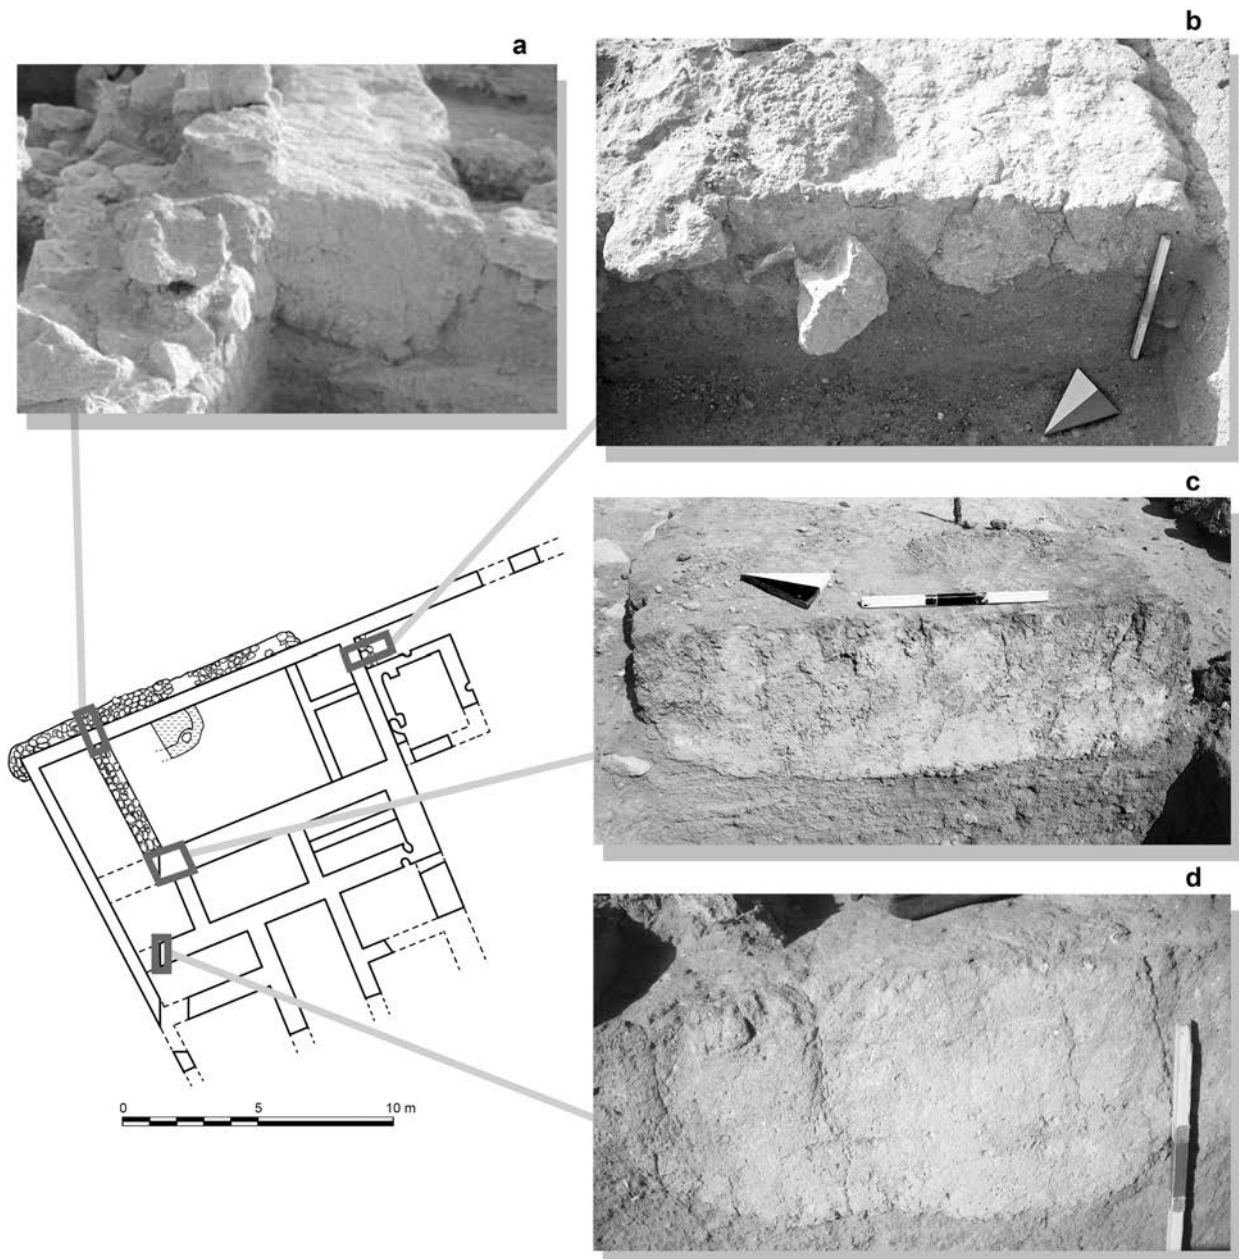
Some of the sections made on masonries of Building XII (RJ-2 Period IV): stonework associated with earthen walls (a–b); earthen walls (c–d); (Photos: A. De Rorre; Plan: V. Azzarà).
